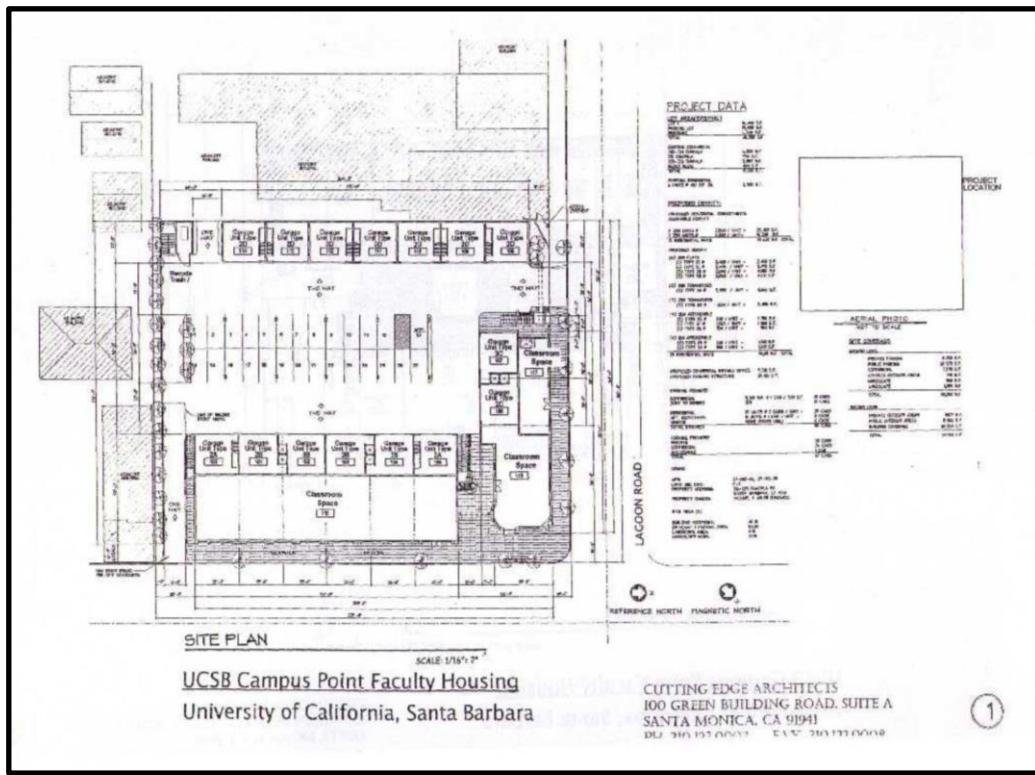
First Floor Plan of UCSB Campus Point Faculty Housing
